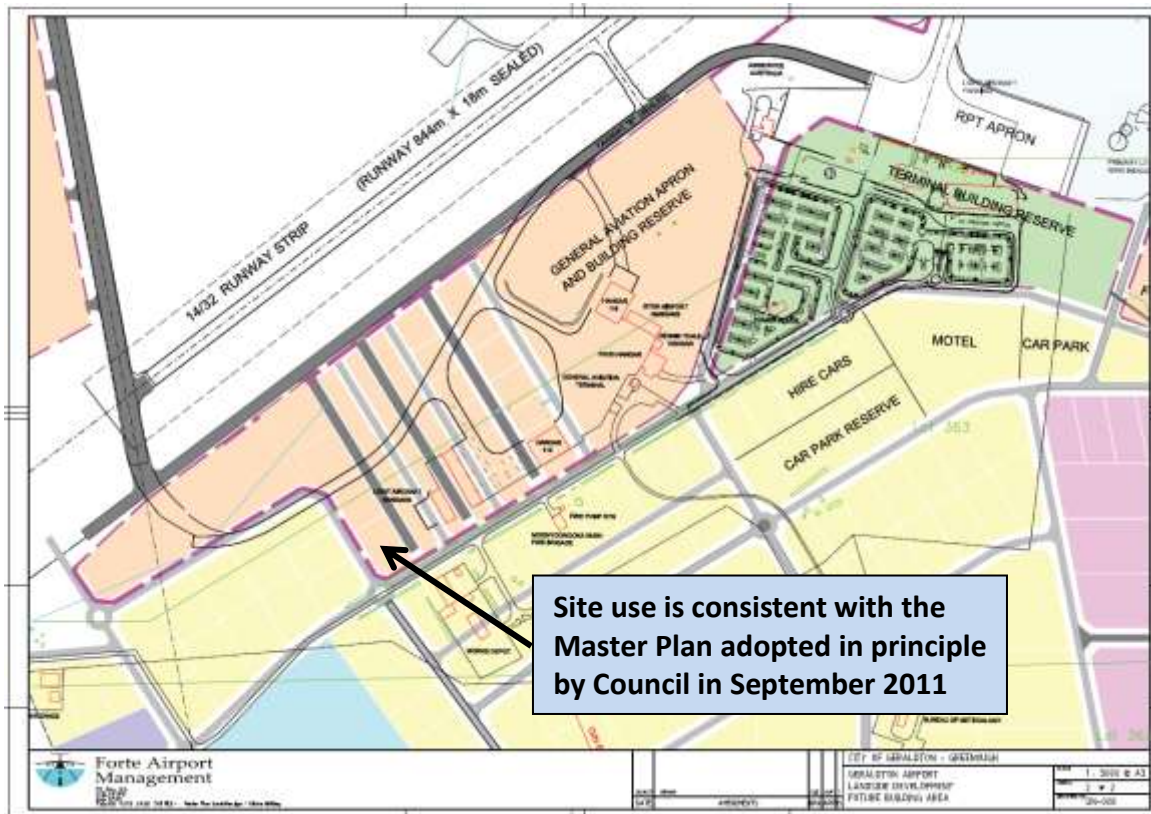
Geraldton Airport – Master Planned GA Apron & Building Reserve
